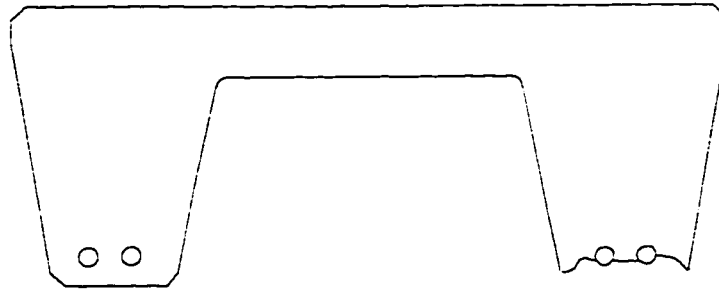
Spalling Girder Web Exposes Flexural Reinforcement
